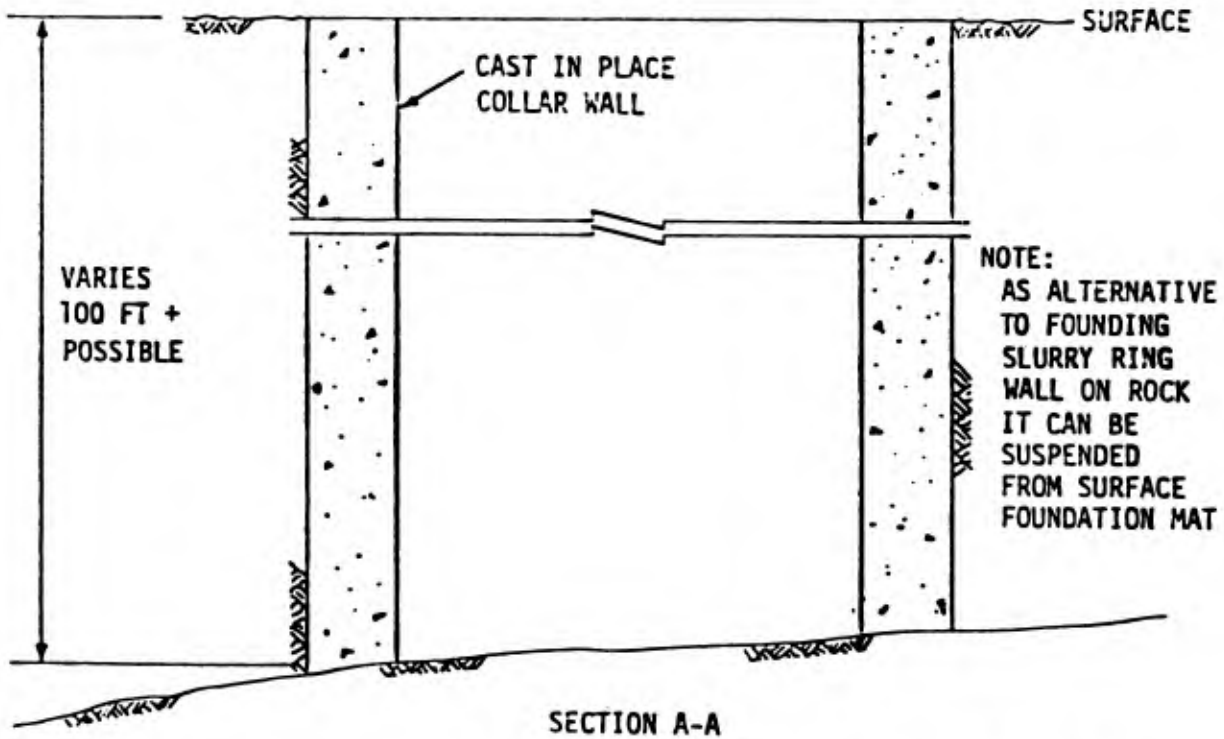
Cast-in-place shaft collar inside slurry trench ring wall
